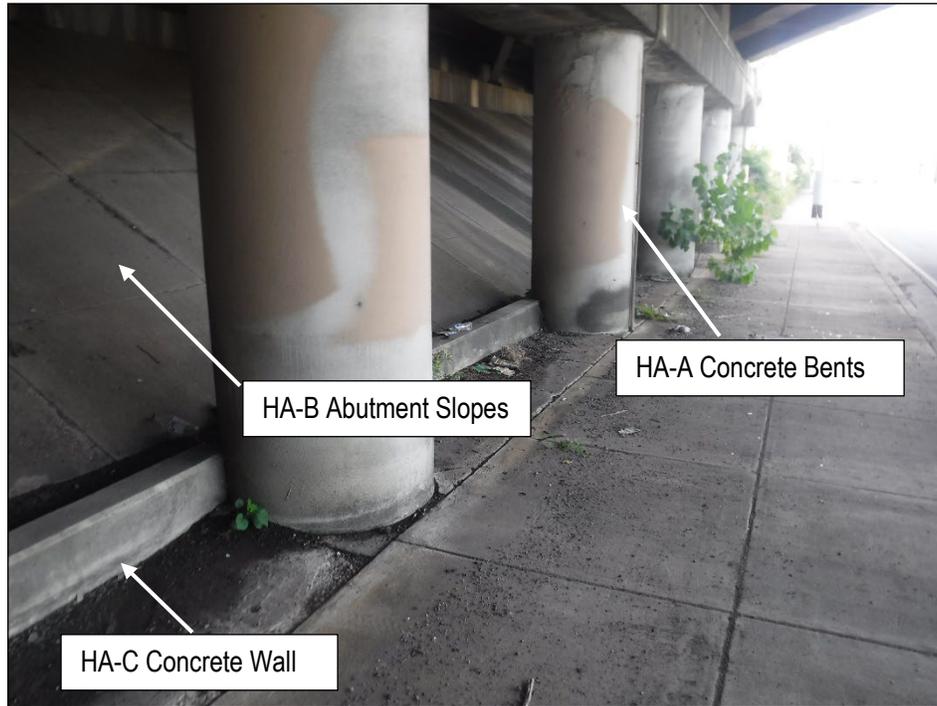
View of HA-A, HA-B, and HA-C on the I-24 bridge over North 1st Street.
